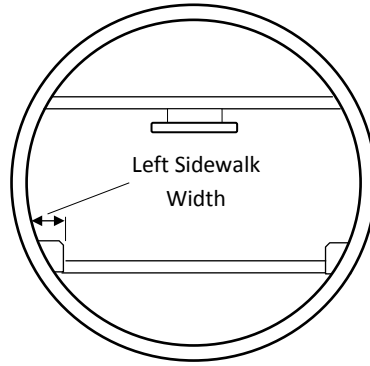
Sidewalk Width Looking in the Direction of Inventory
